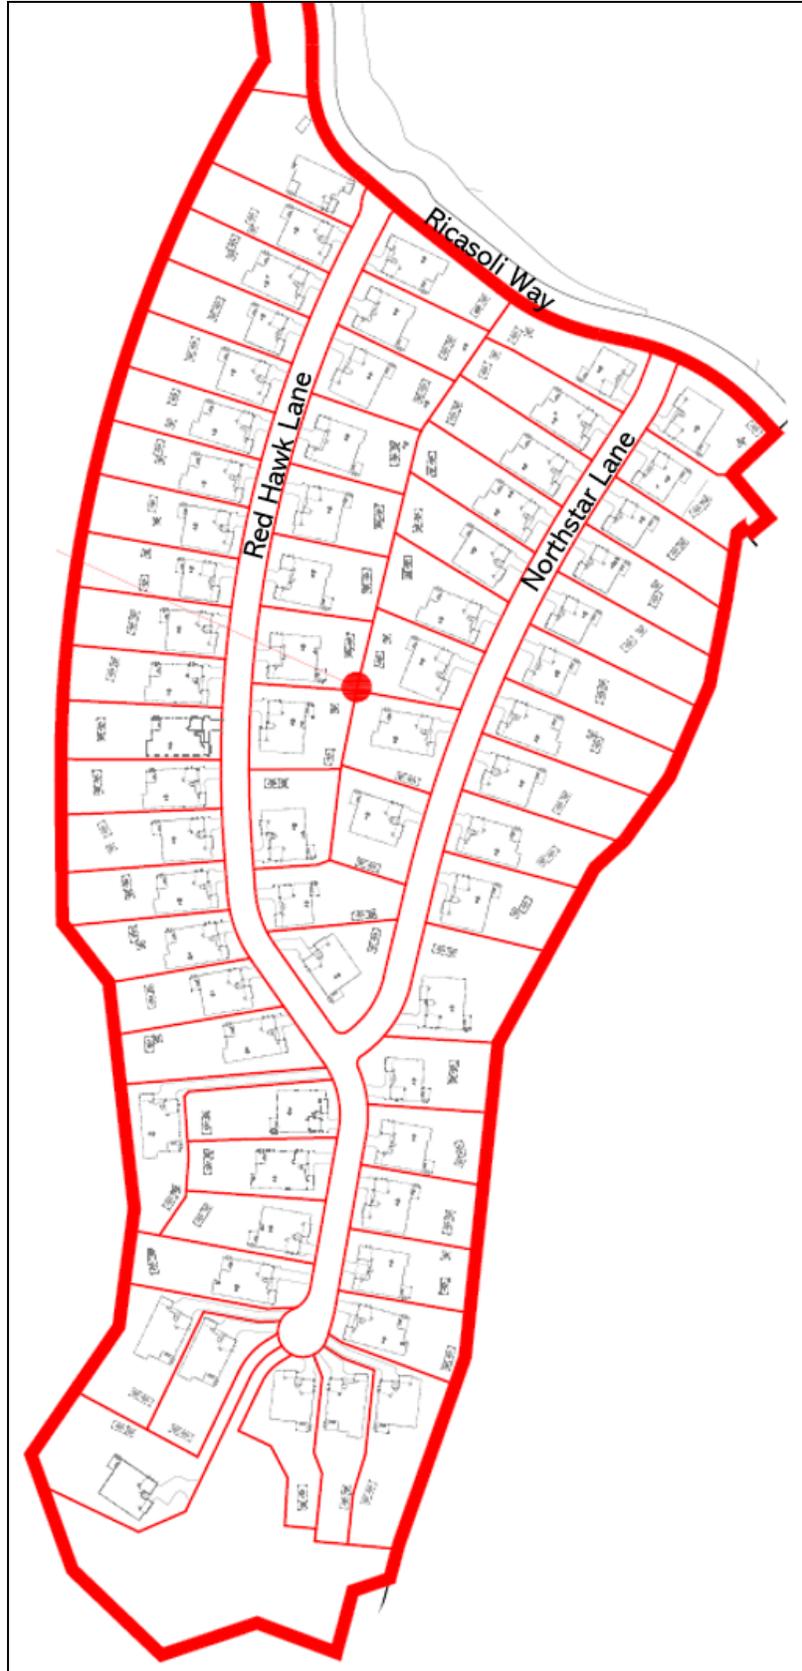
All 65 lots in Subarea B with existing building footprints shown.
